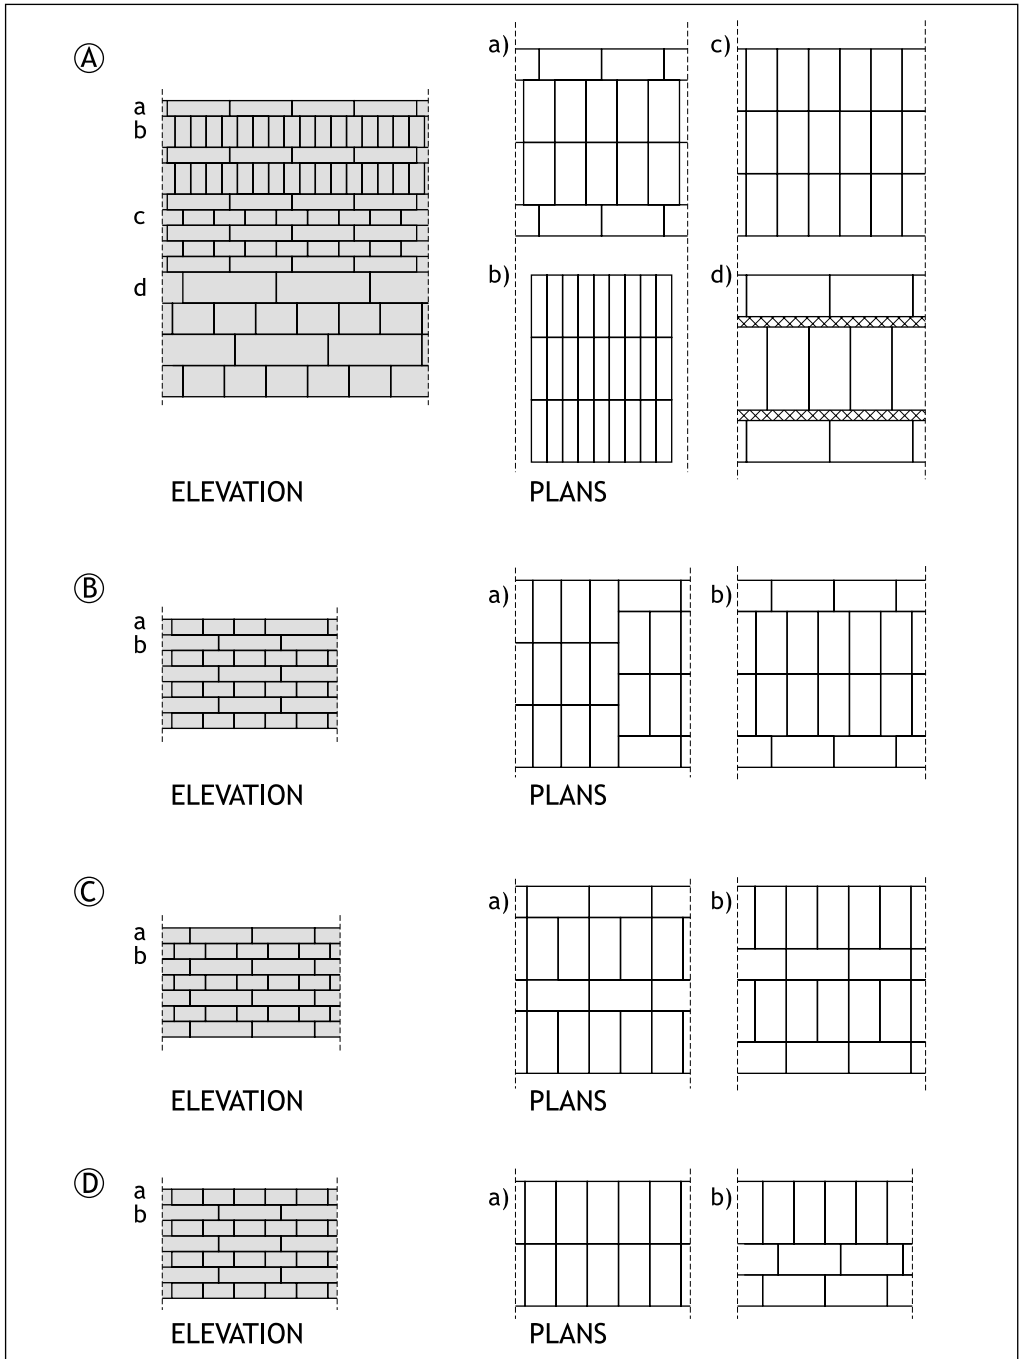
Examples of bondwork encountered on Kom A in Naqlun
